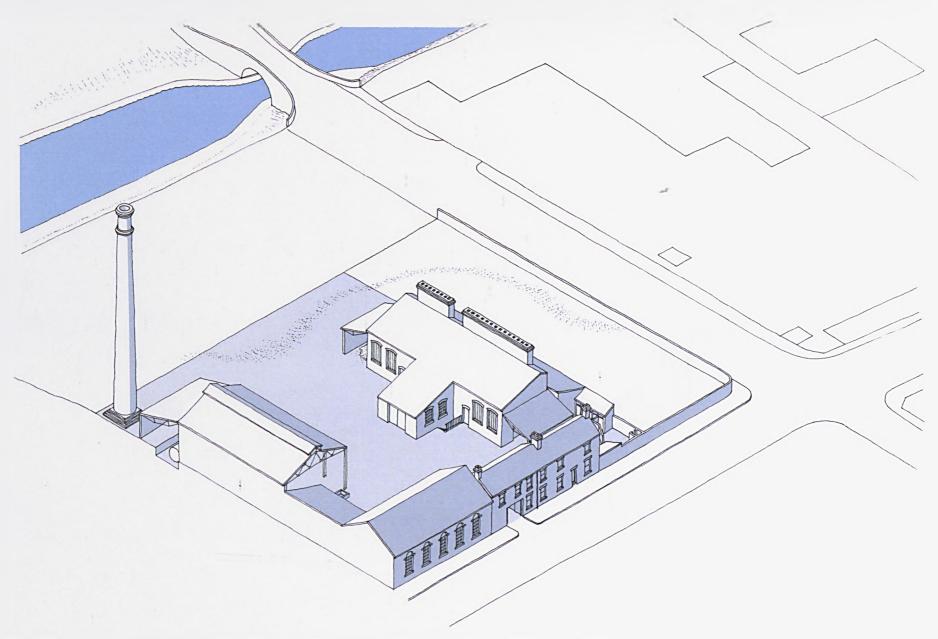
Isometric reconstruction of the Coleridge Road steelworks as proposed in 1898, scale 1:500 (author).
